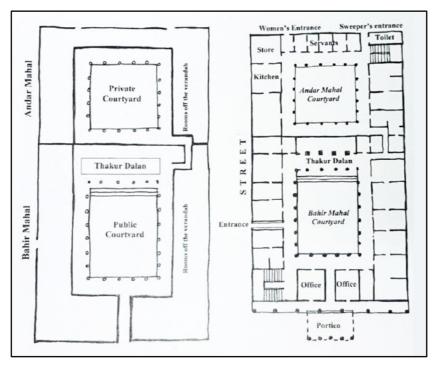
Generic plan and sample generated plan of indigenous house in old Kolkata
